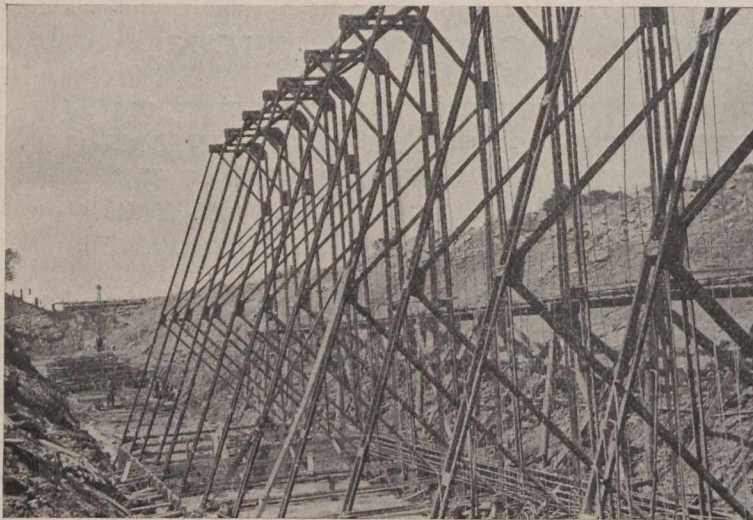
End Section of Steel Frame for West Entrance Wall at Port Weller, Before Placing Reinforcing Steel.
